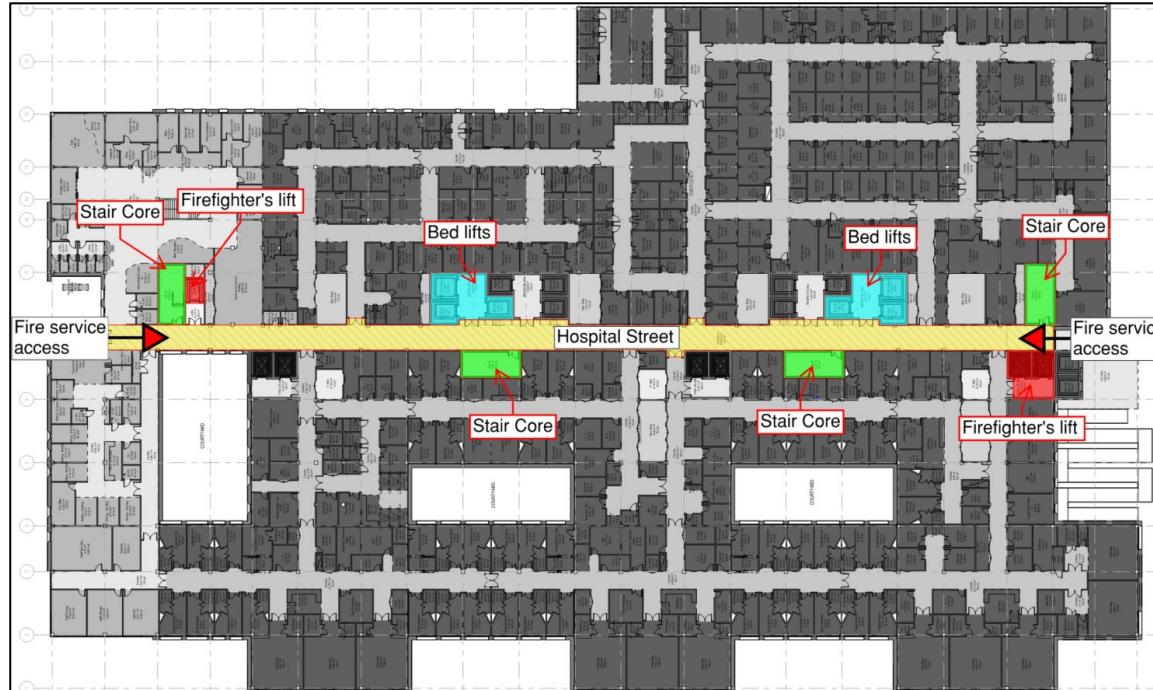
Schematic ground floor plan showing fire service entry points, stair cores and fire evacuation lifts
